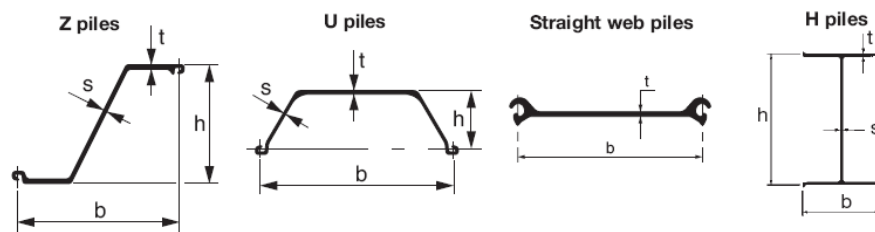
Typical Hot-Rolled Sheet Pile Sections (ArcelorMittal, 2008)
